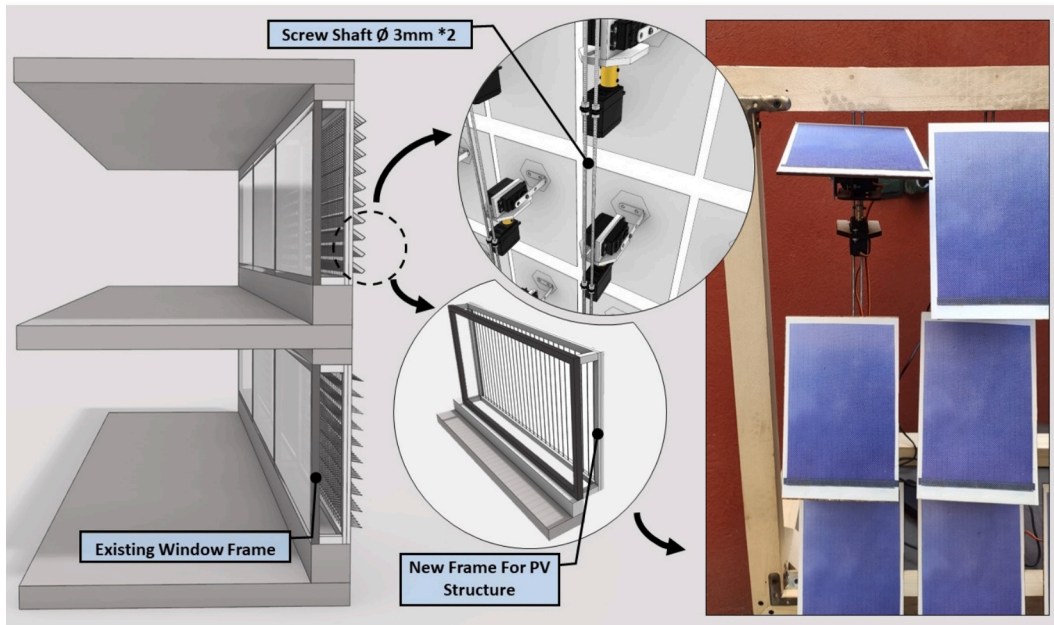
Left: Details of the window frame and PV module structure. Right: Real view of the experimental prototype.
